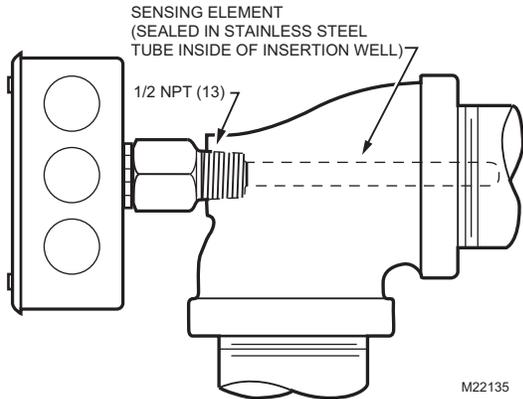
Method of mounting C7021D, C7023D, C7031D, C7041D Sensor.
